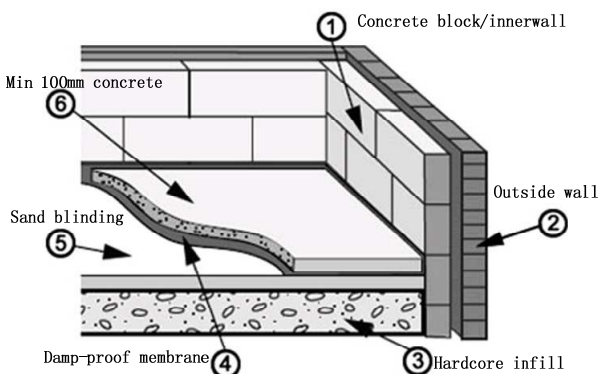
Typical structure of a floor and a wall⁽¹⁴⁾
